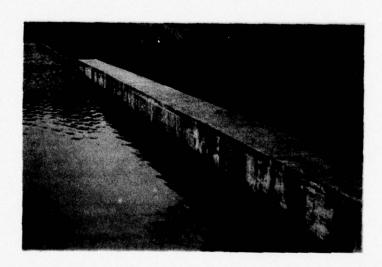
Upstream view of the right abutment nonoverflow abutment section
